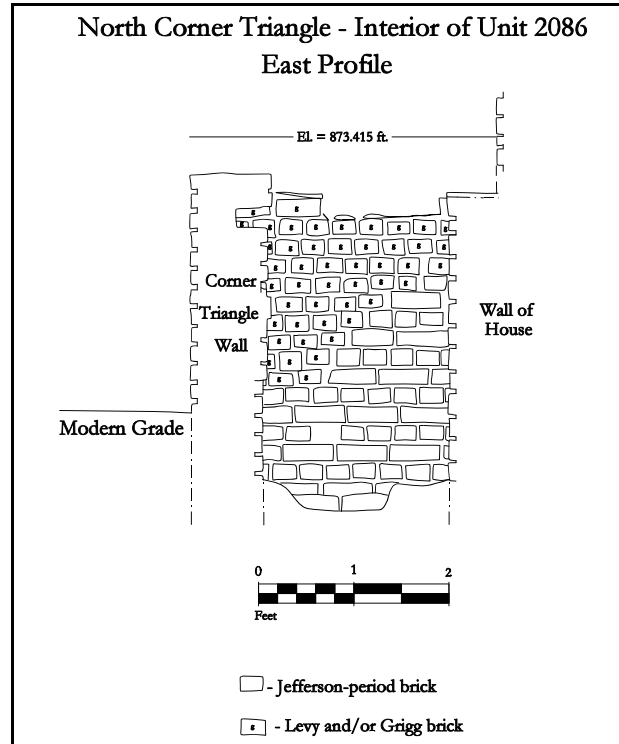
View of interior brickwork in east wall of the North corner triangle.
